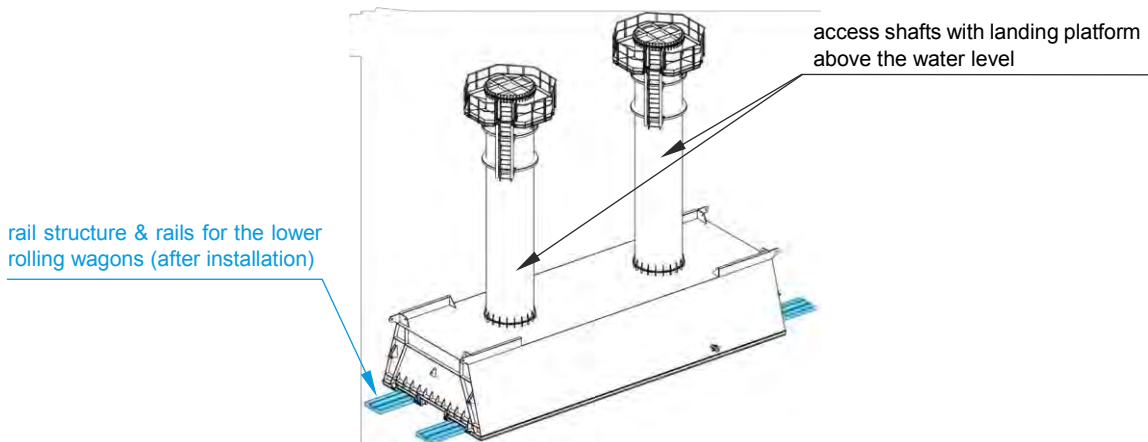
Habitat structure that will be used to install the rail system on the lock floor.
